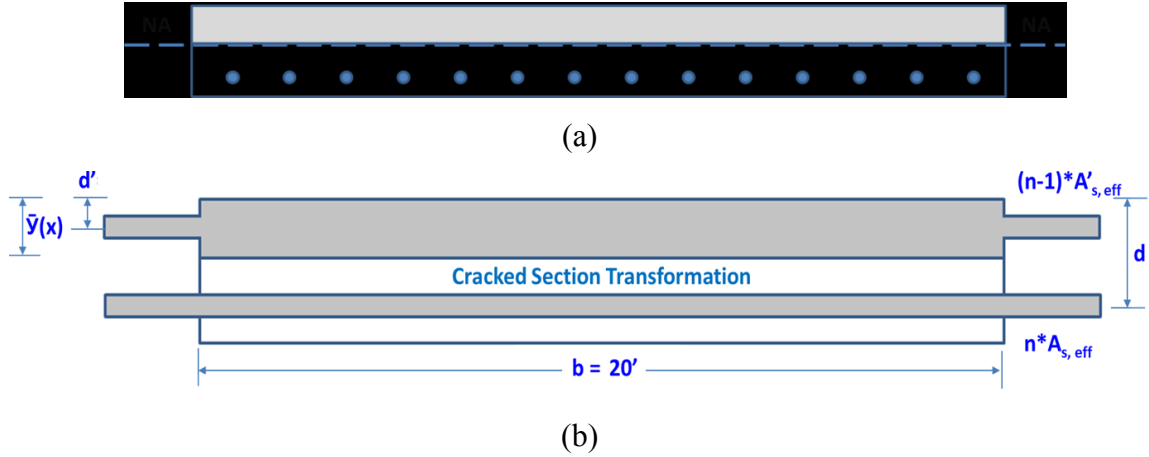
(a) Cracked section assumption with tensile load taken by vertical steel reinforcement and compressive load taken by concrete; (b) cracked section transformation.
